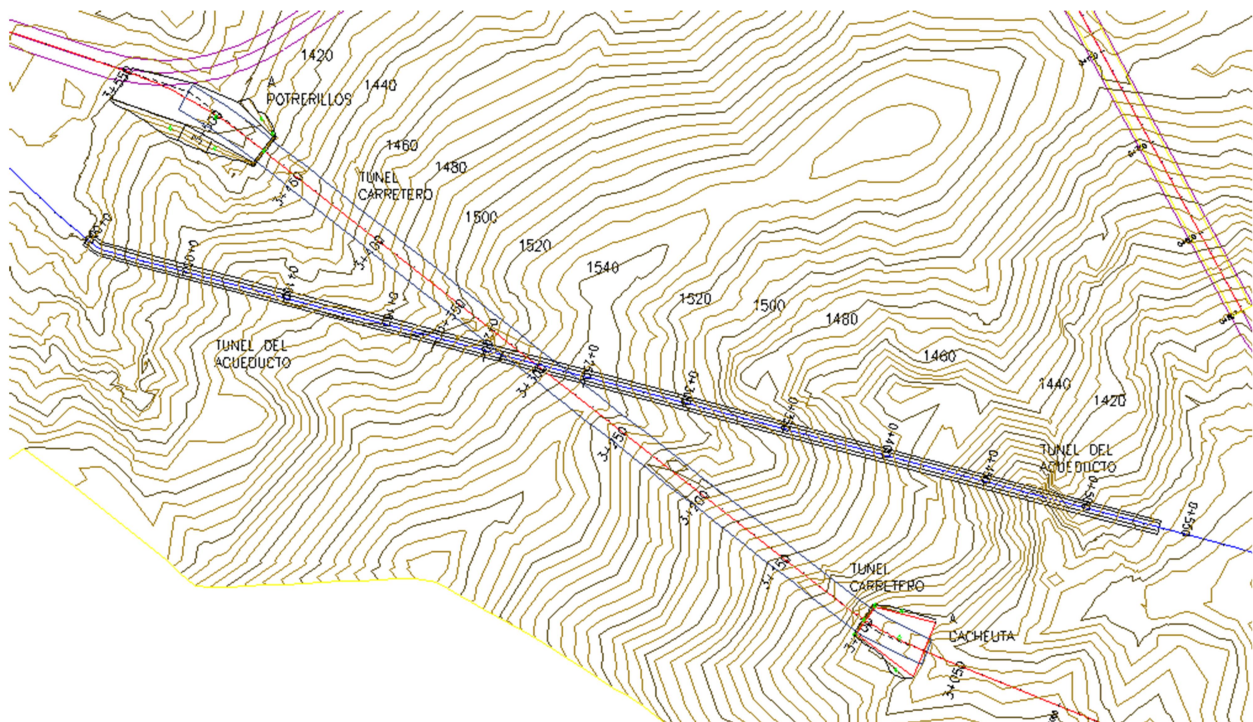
Location of the road tunnel (Tunel Carretero) and the aqueduct tunnel (Tunel del Acueducto).
